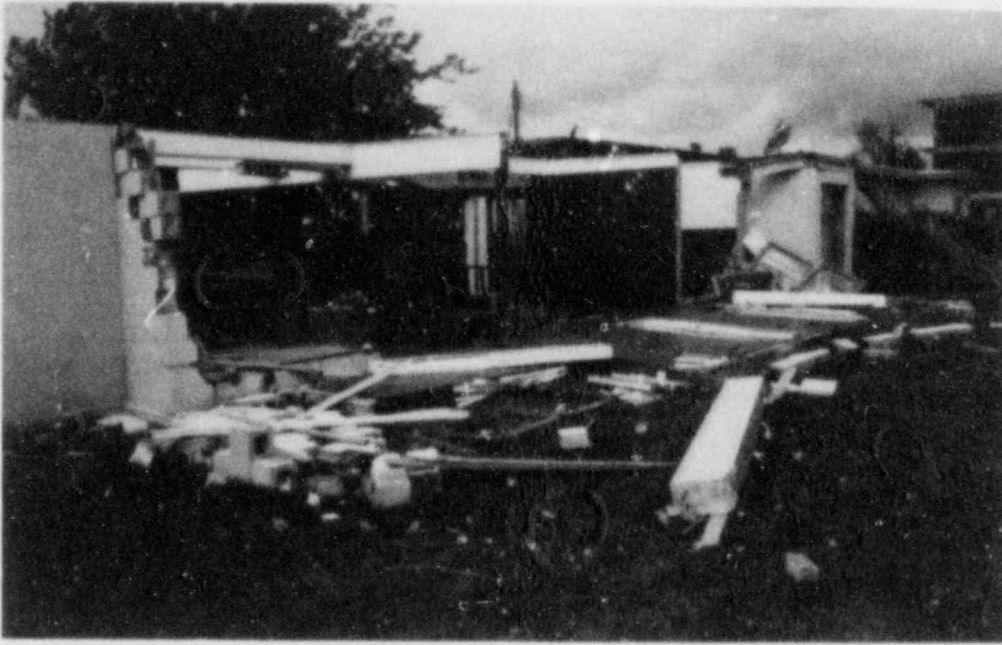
FRONT WALL OF THE BASE LAWYER'S OFFICE.
